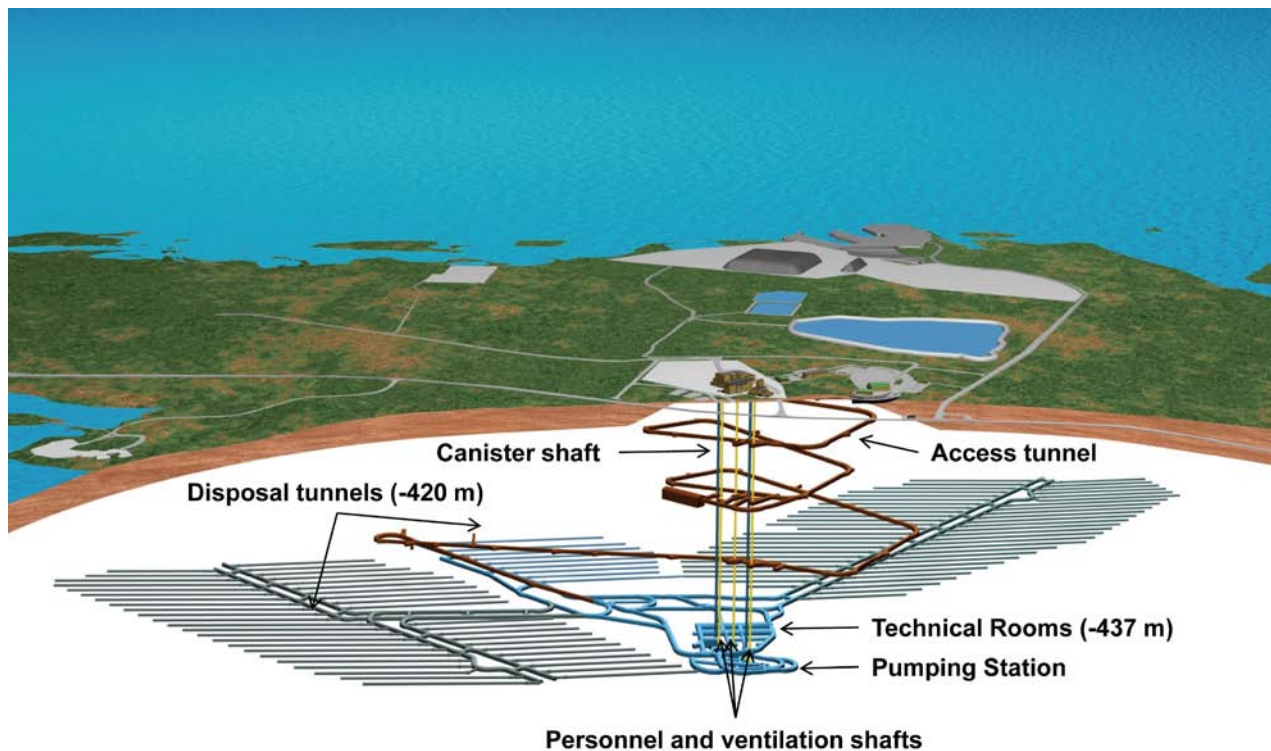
A schematic presentation of the layout of the underground rock characterization facility and the network of disposal tunnels (KBS3-V option).
